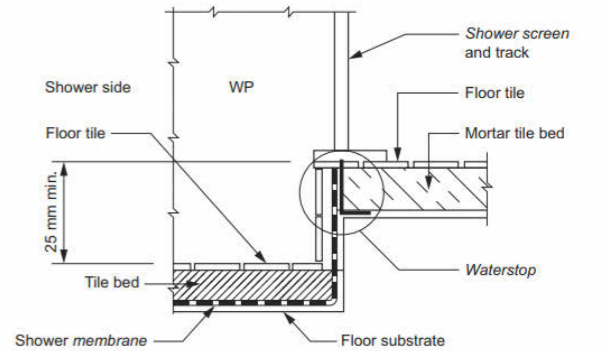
Typical enclosed stepped down shower construction (membrane above tile bed)
